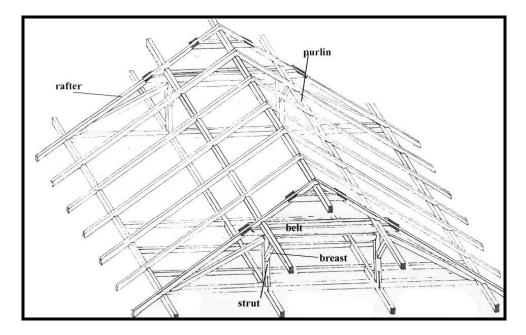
Two purlin hung roof is composed of rafters, purlins, diagonals, collars and struts (Binan, 1990:94).
